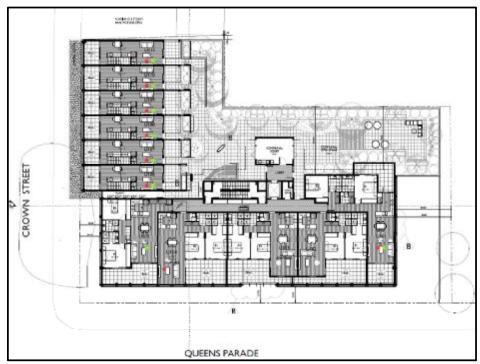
Proposed First Floor Plan (\*Source: ADM Architects)
